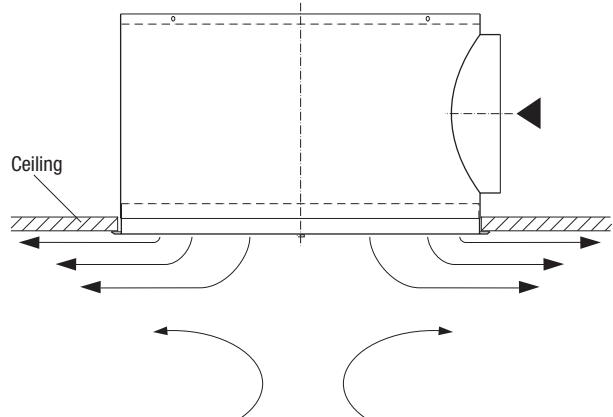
Jet pattern of outlet installed flush with the ceiling
